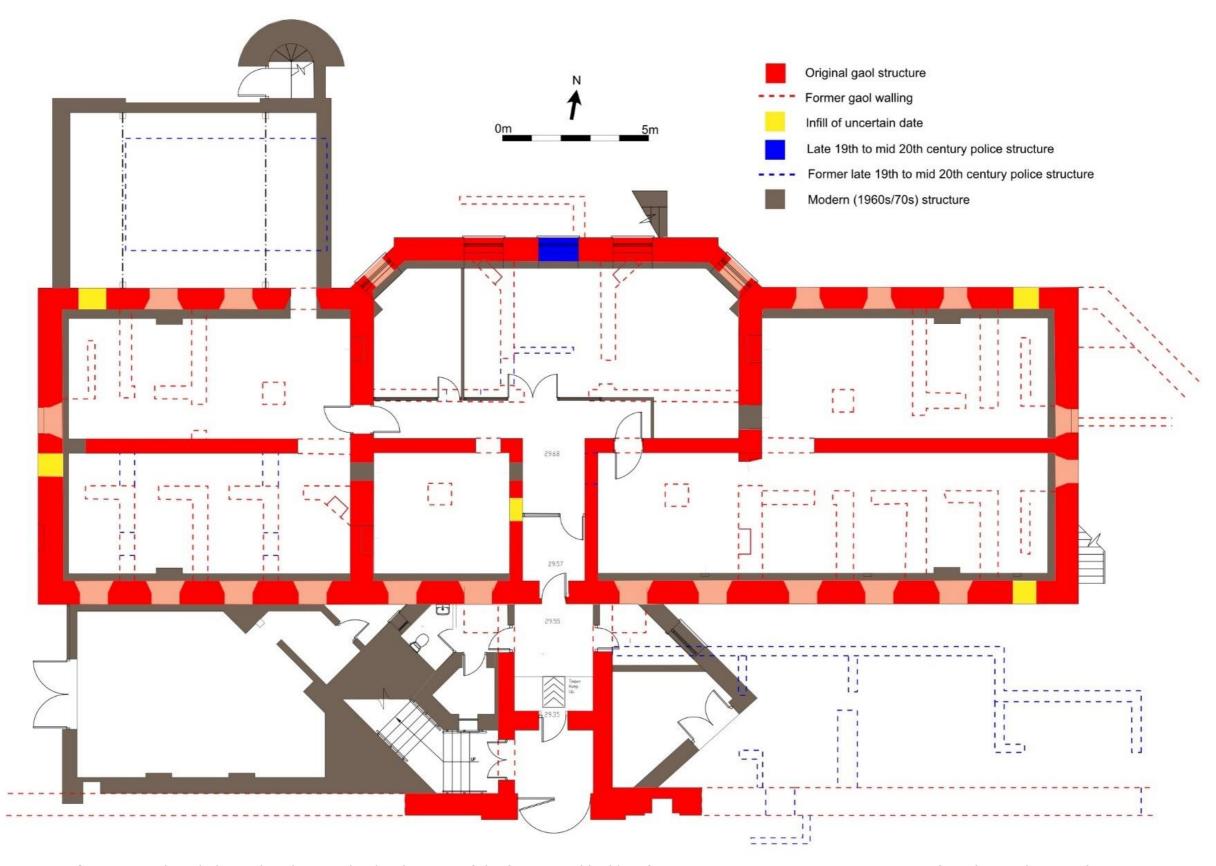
A broad phase plan showing the development of the former gaol building from its construction in 1820 to its current form (November 2023).
